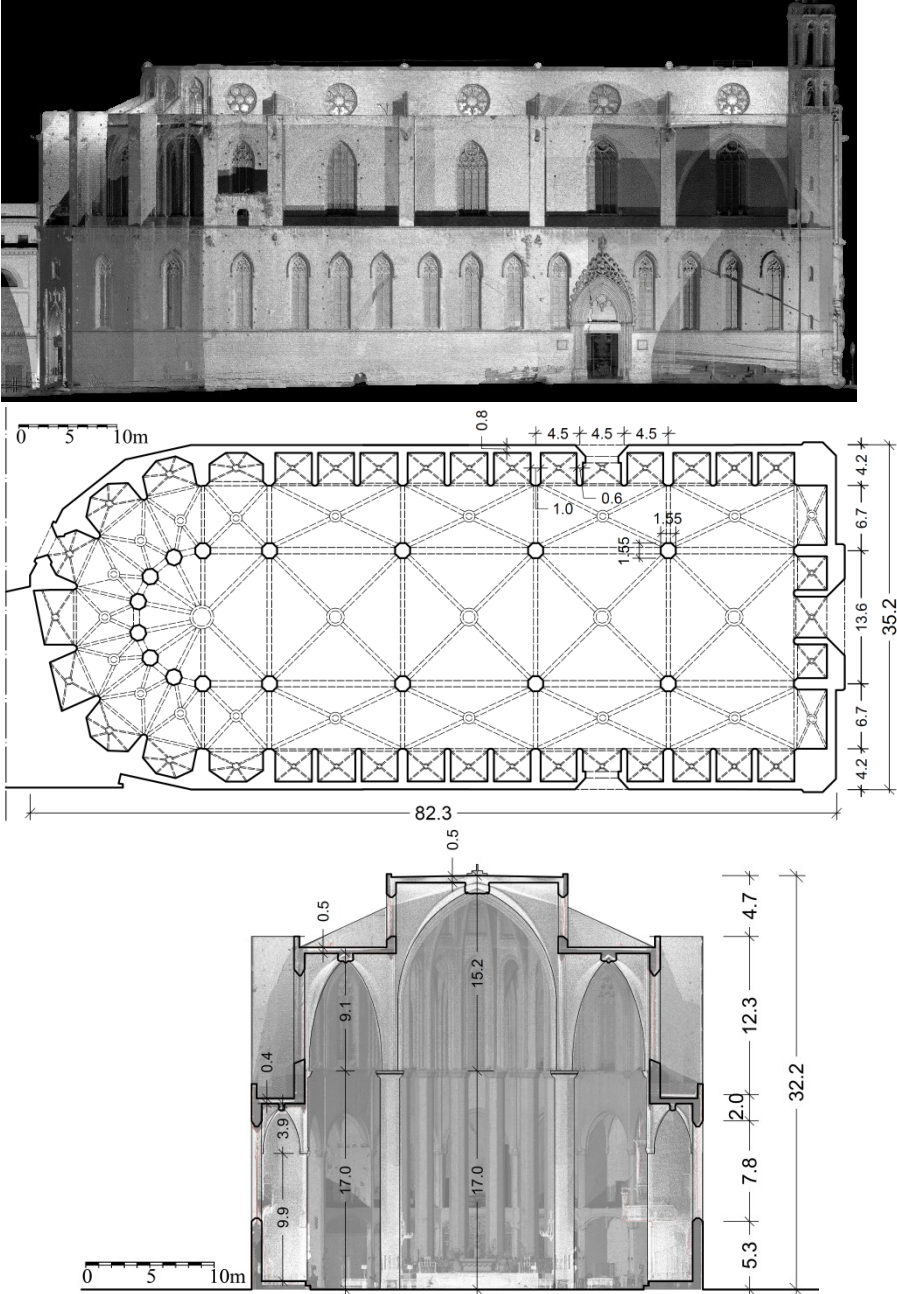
Lateral view, plan, transversal section of *Santa Maria del Mar* cathedral
